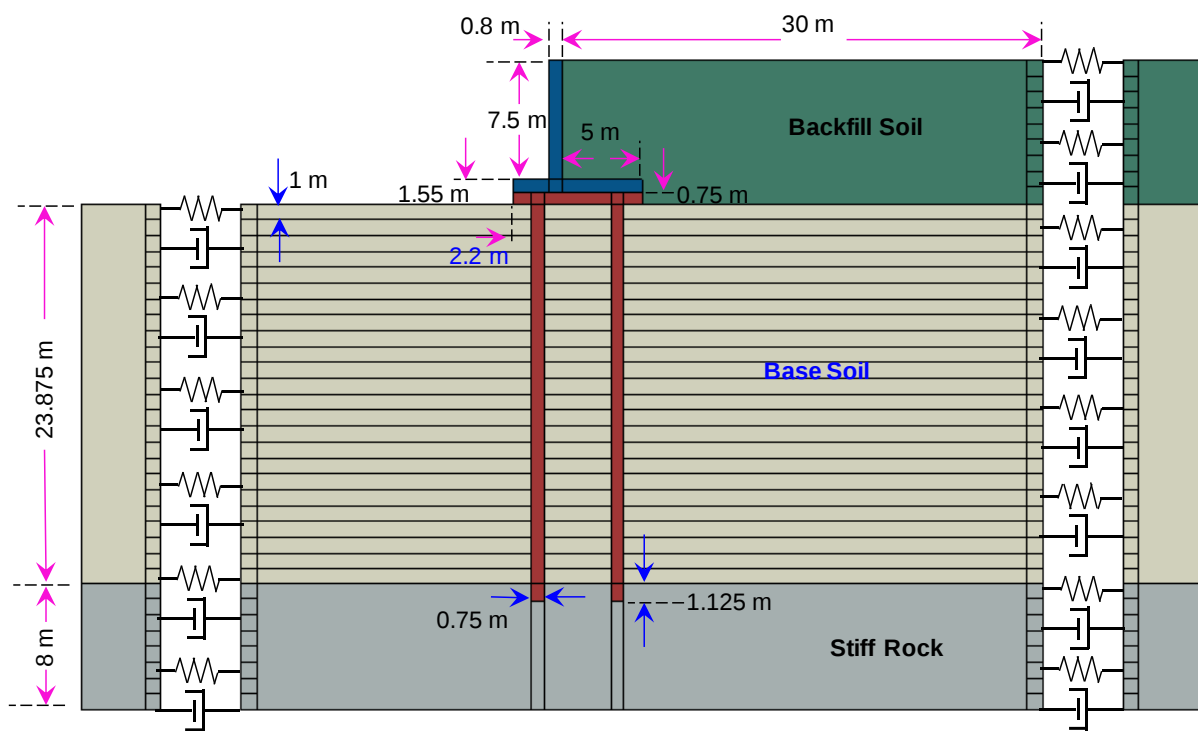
Geometrical details of RW founded on R-S piled foundation.
